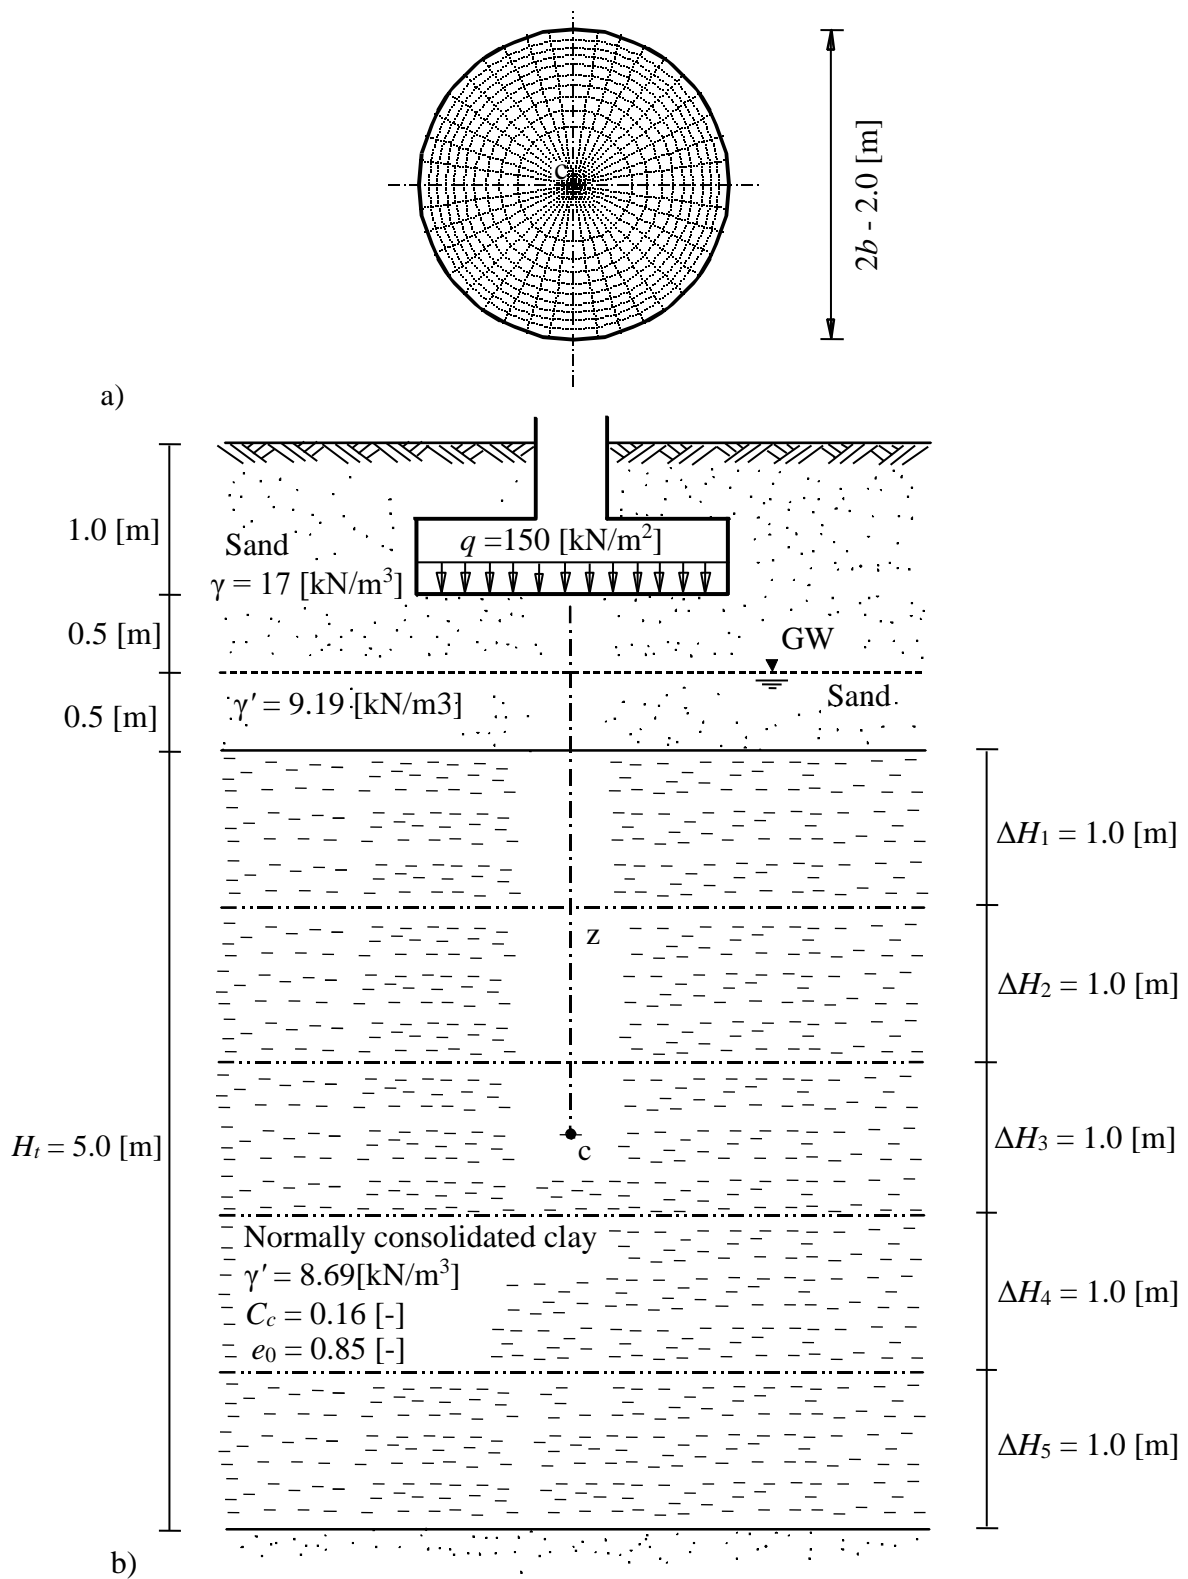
a) Plan of the footing with dimensions and FE-Net
